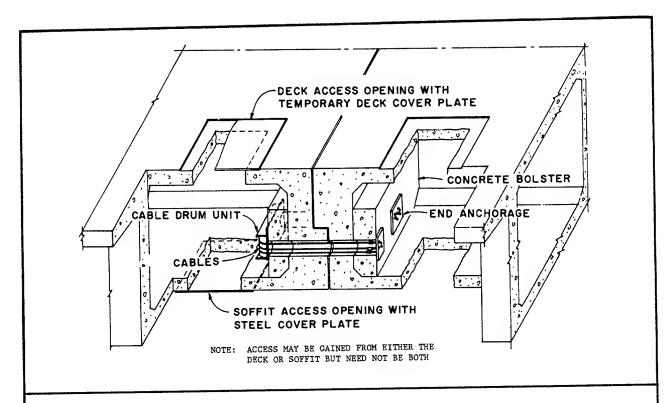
Longitudinal Joint Restrainer for Concrete Box Girder (from Reference 5)
